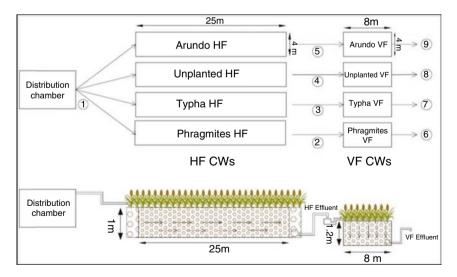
Schematic layout plan (up) and cross-section (below) of pilot-scale hybrid CW in Isfahan, Iran and the sampling points [40]
